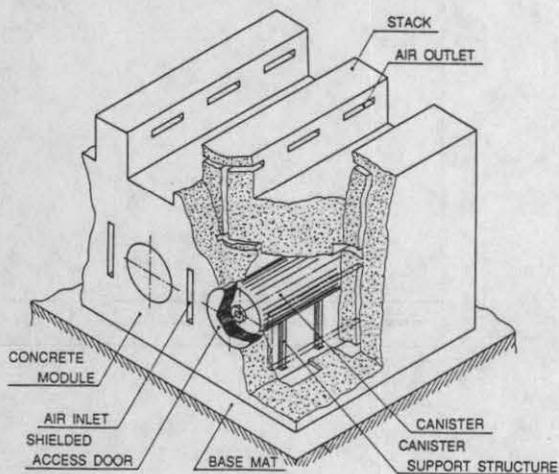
Japanized Horizontal Modular Storage System Arrangement
